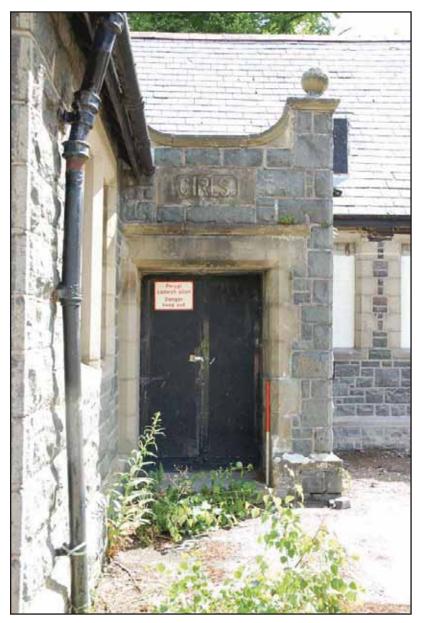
School Bank Road south building west facing elevation- porch detail: note inscribed stone. Scale: 1.0m
